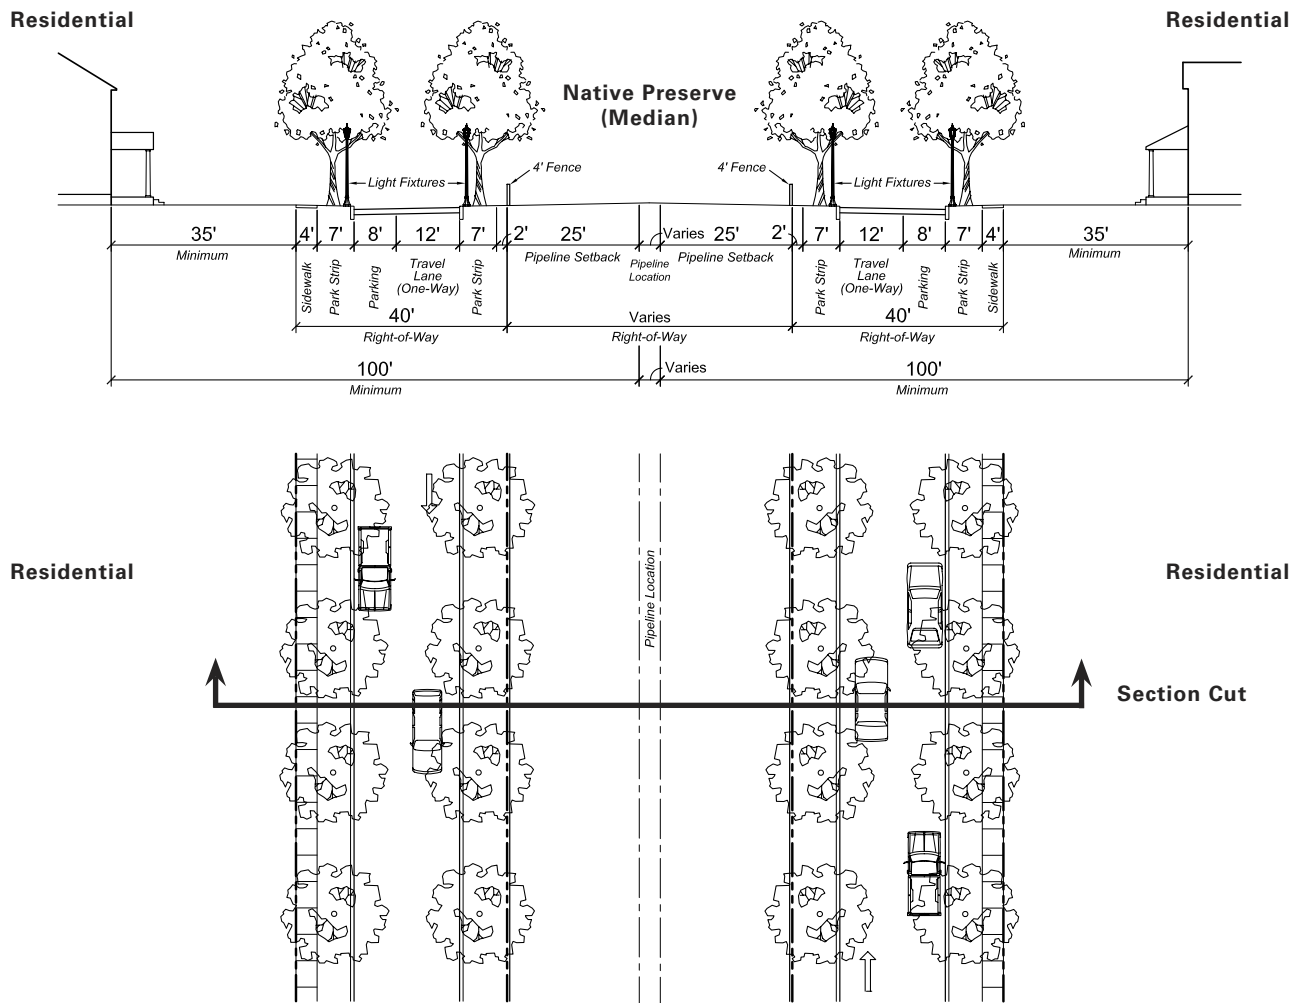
Proposed Section and Plan: Neighborhood Street E
